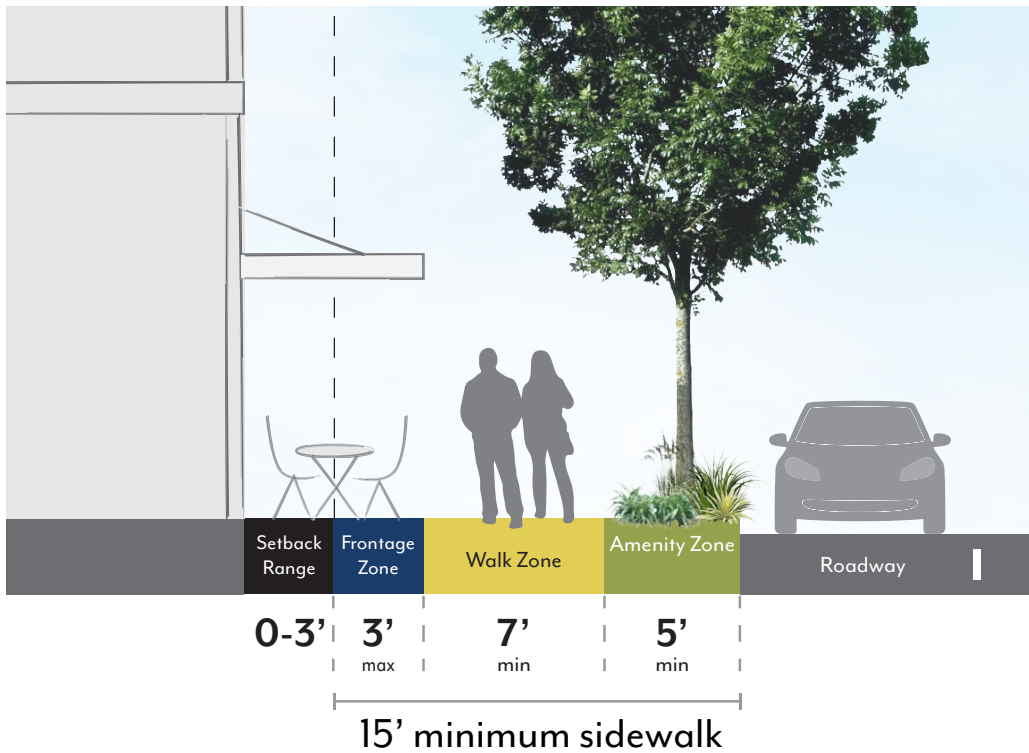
Sidewalks - Washington Mixed Use (WMU)
